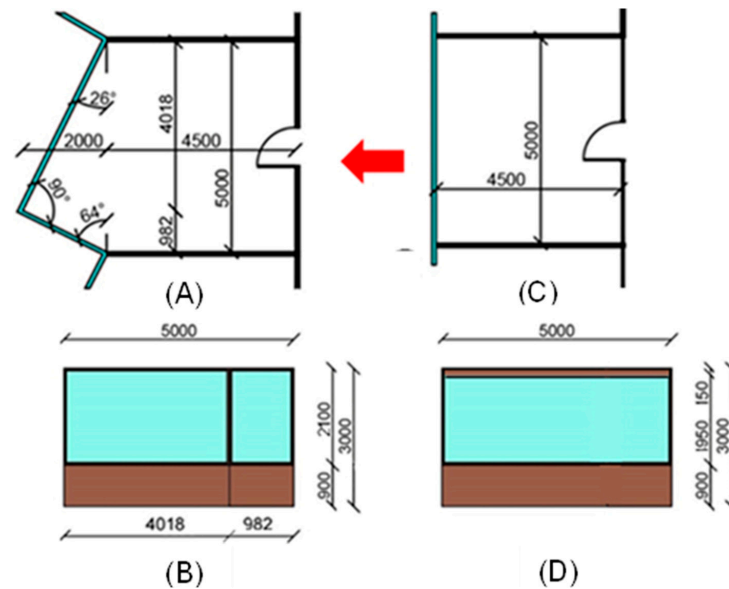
(A) An illustration of an office room plan that implements solutions for multi-angled façades. (B) A façade system with several angles for a room. (C) An office room layout with flat façade. (D) Flat façade.
